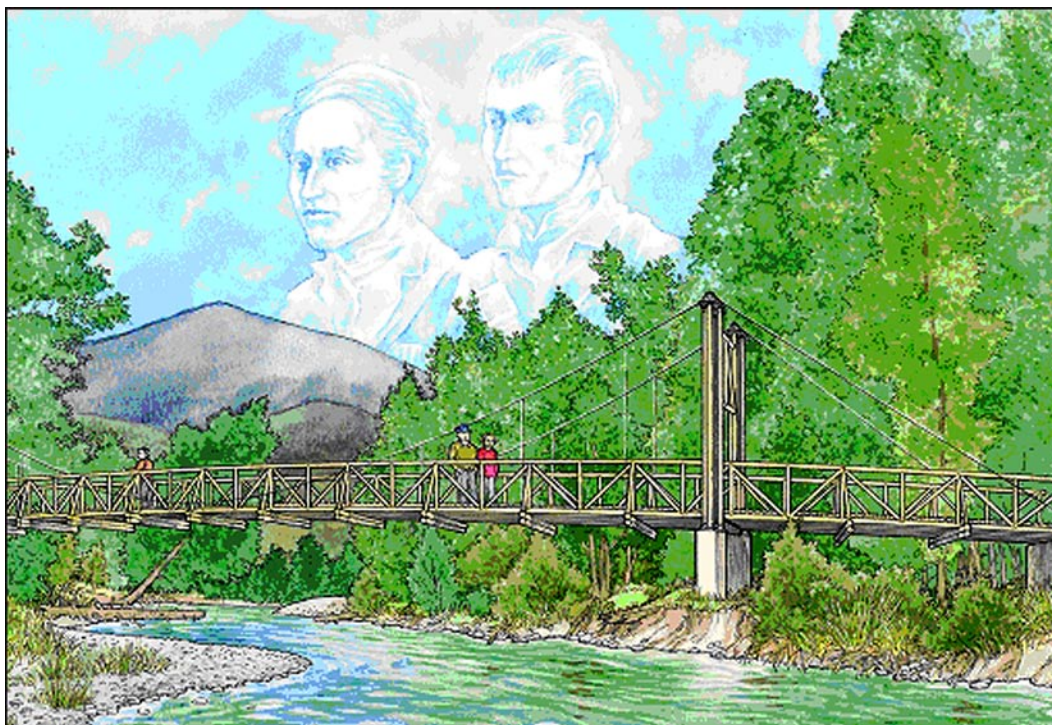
Cable suspension bridge planned for Travelers' Rest State Park, Lolo, Montana.
